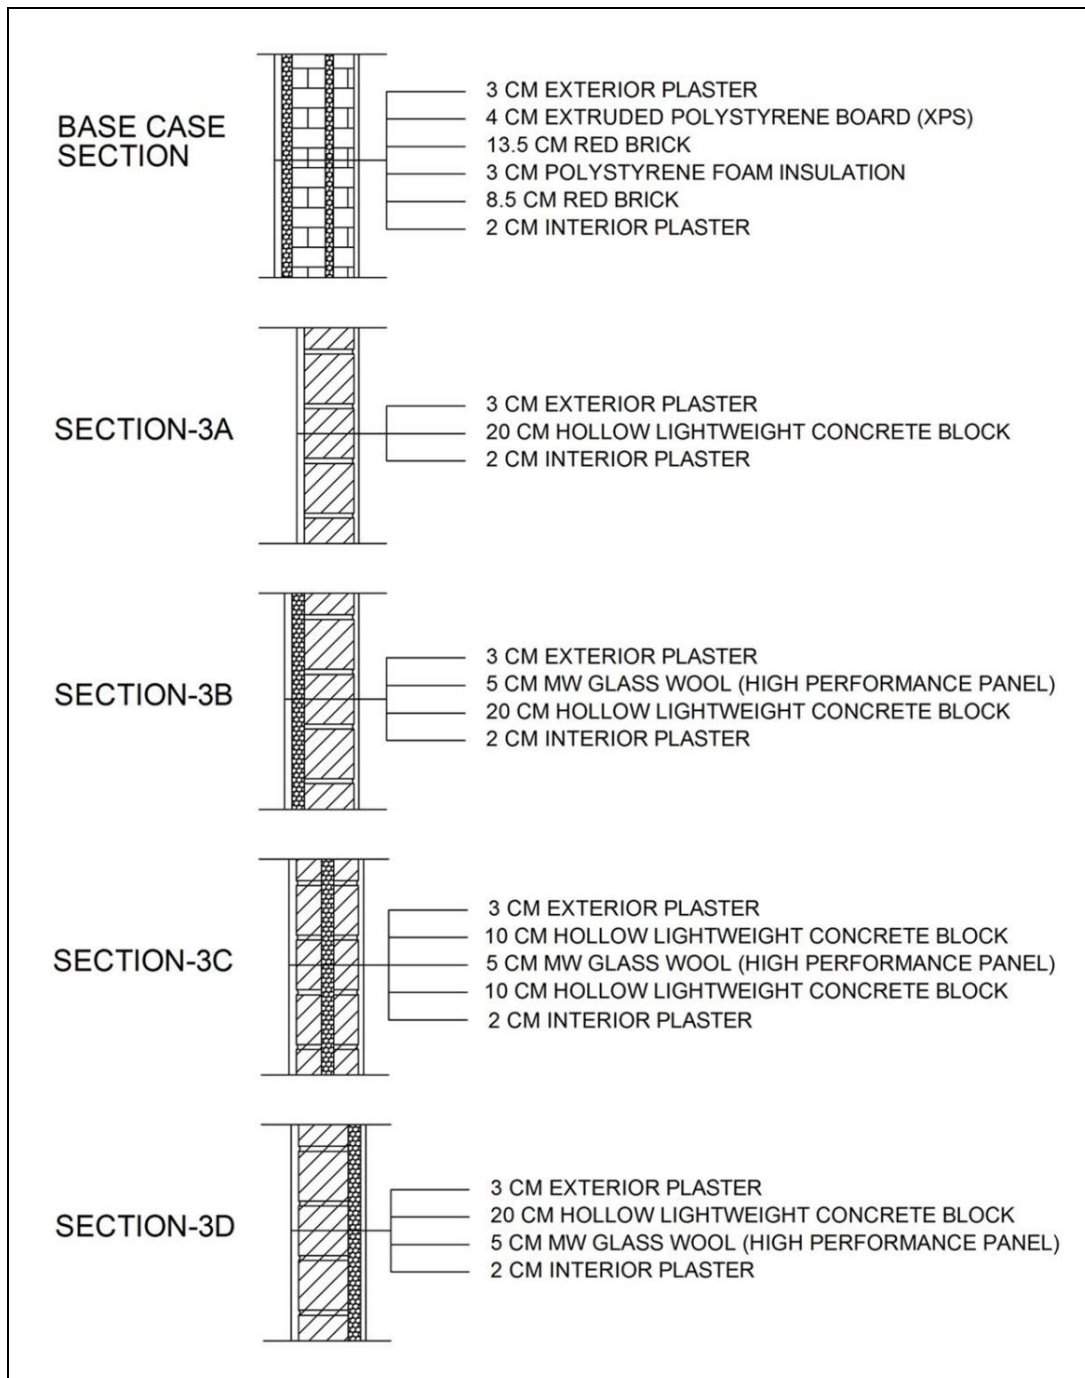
Hollow Lightweight Concrete Blocks for four different Wall System Sections and The Base Case Section.
